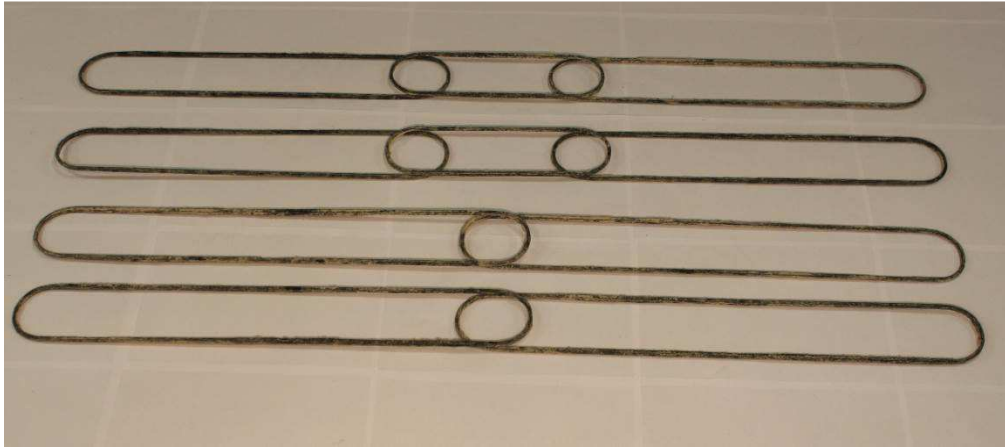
Sand coated CFRP loops reinforcement for beam specimens A and B
